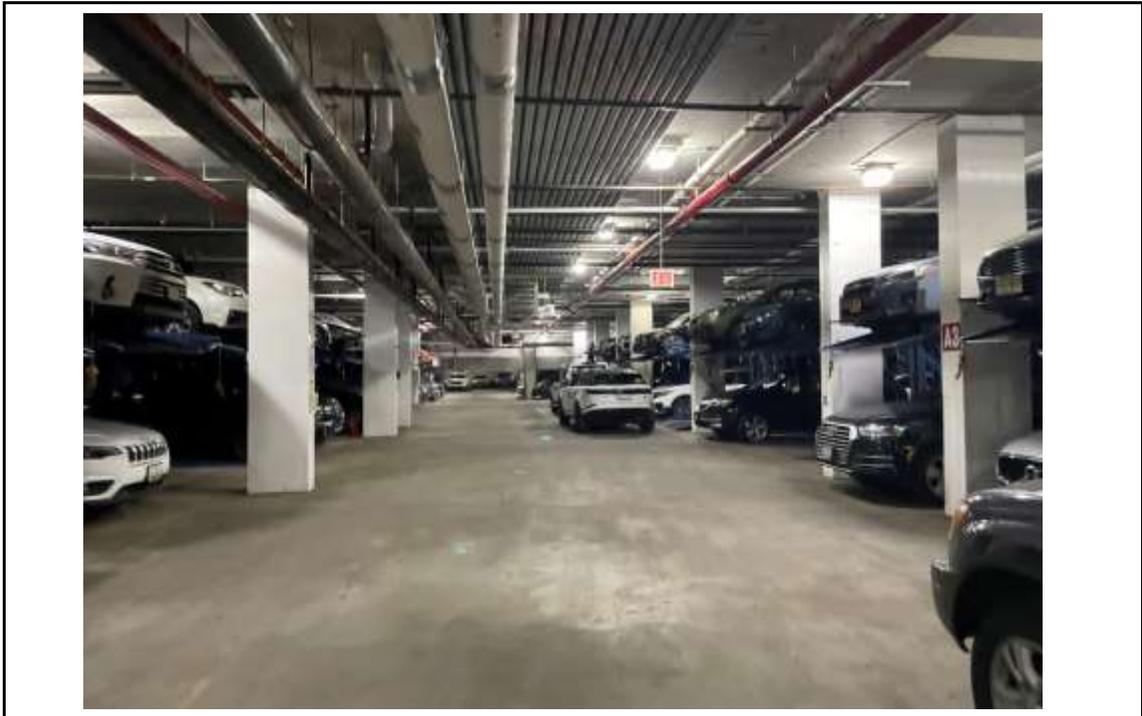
Subgrade parking garage concrete slab, facing southeast. 20 June 2022.
